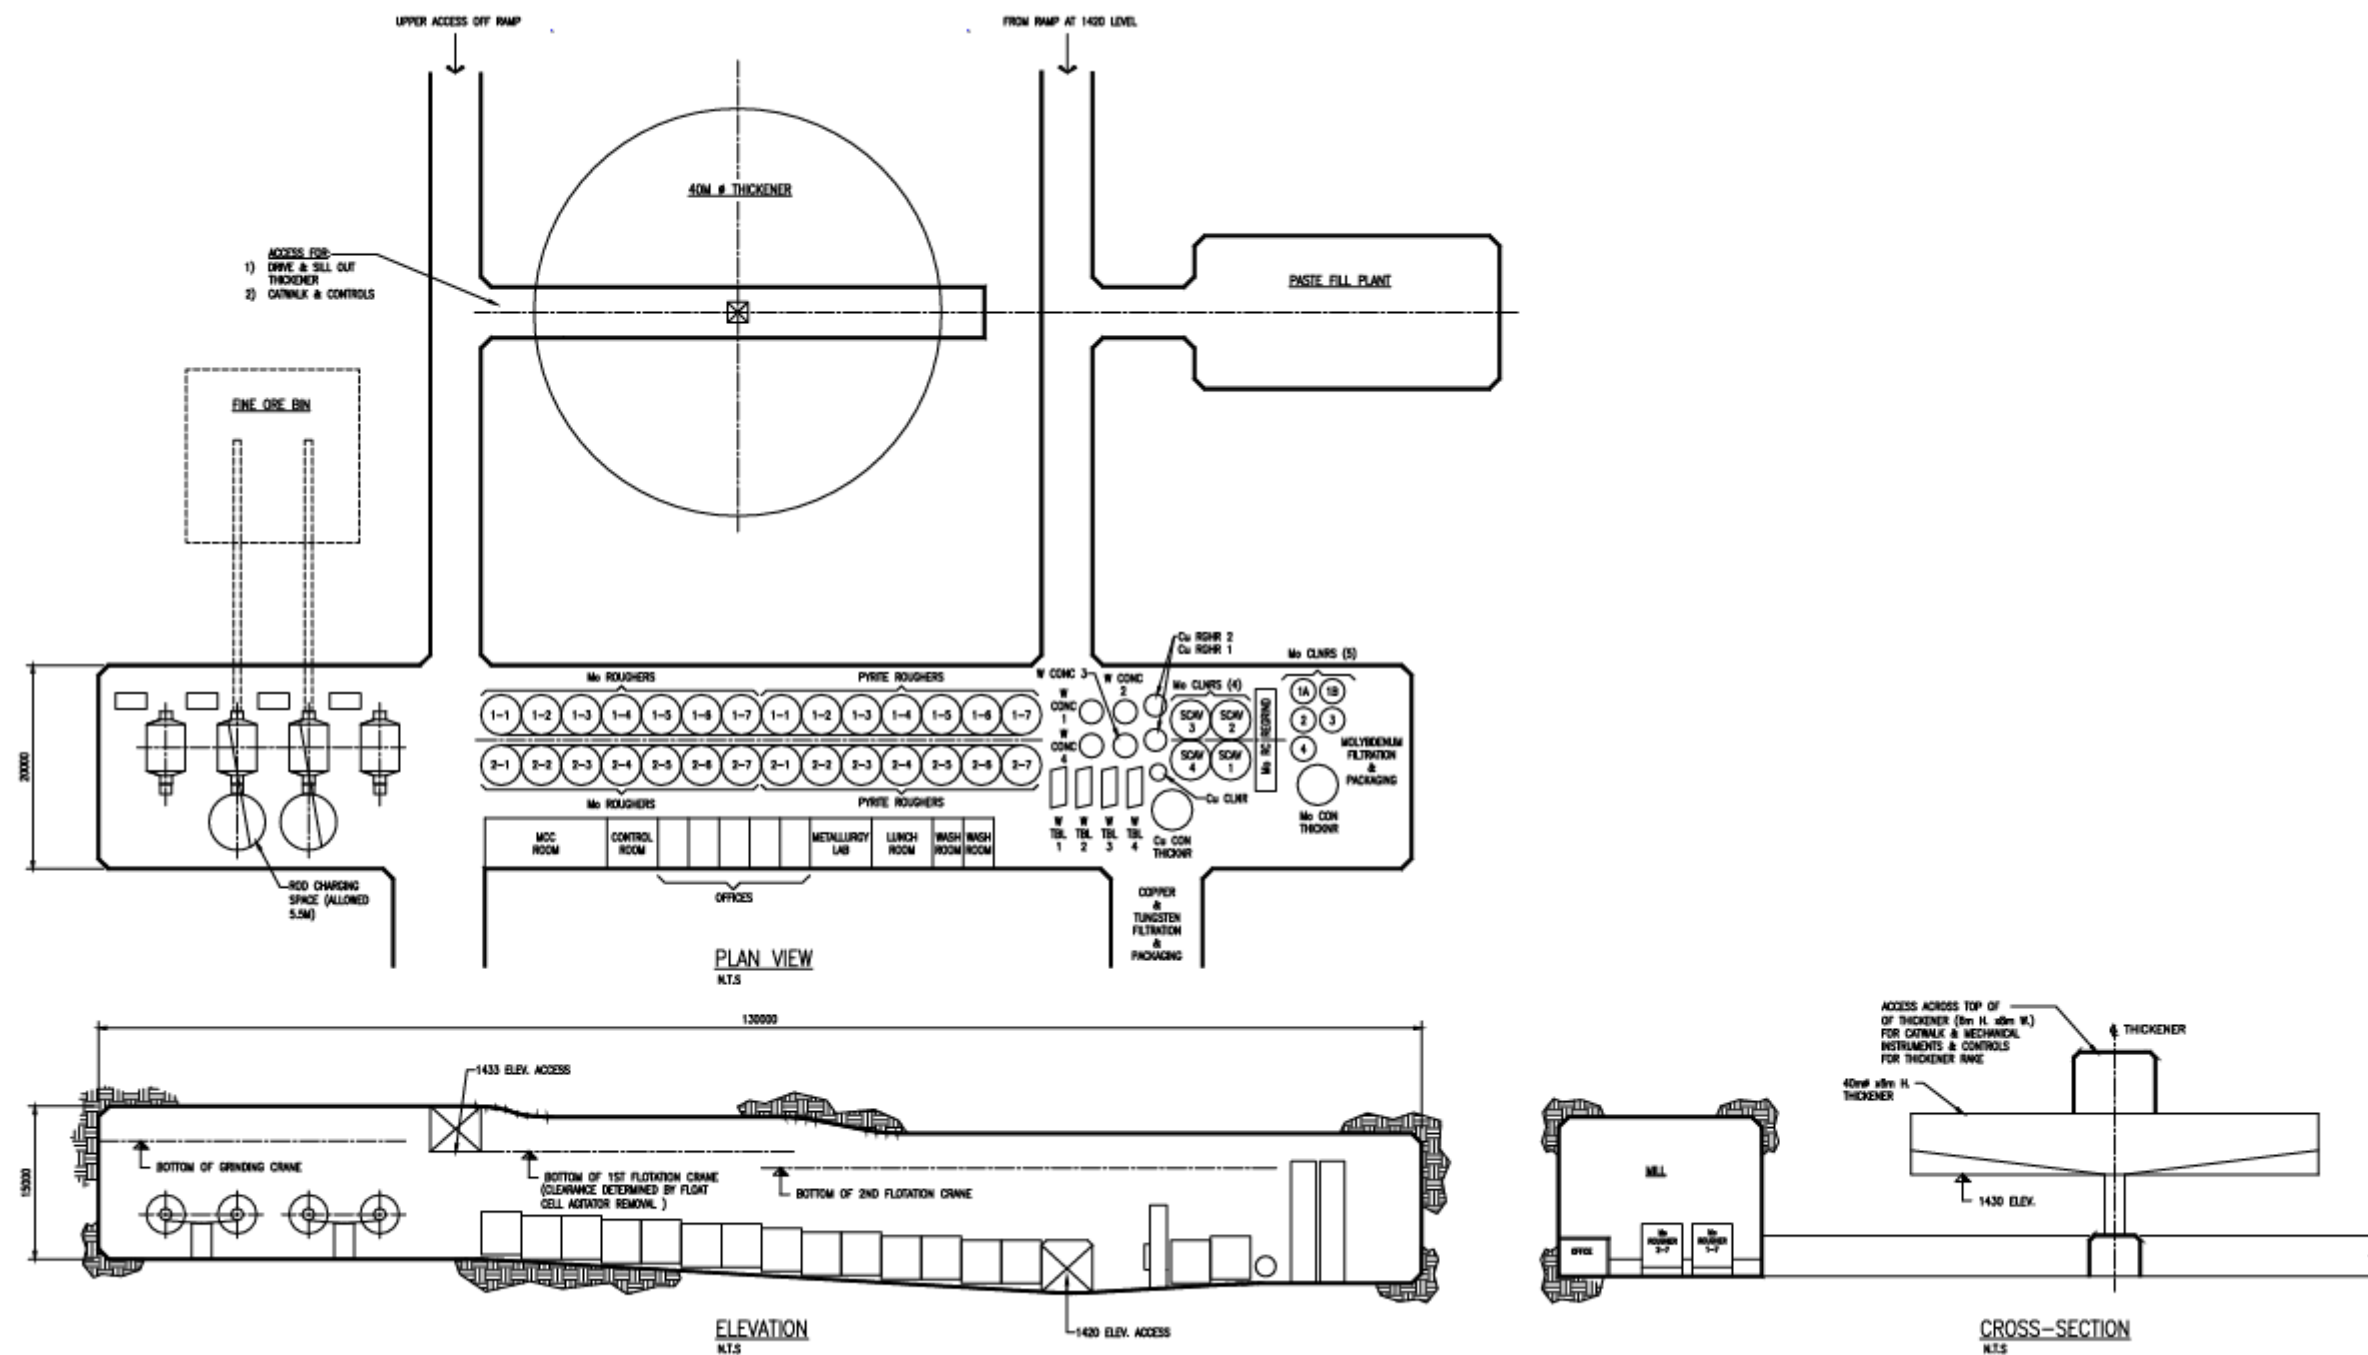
Underground Processing Plant Preliminary General Arrangement
